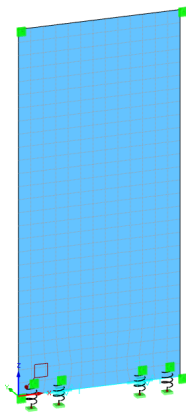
Visualization of a cross-laminated shear wall modelled with the proposed finite-element modelling strategy, method F.
